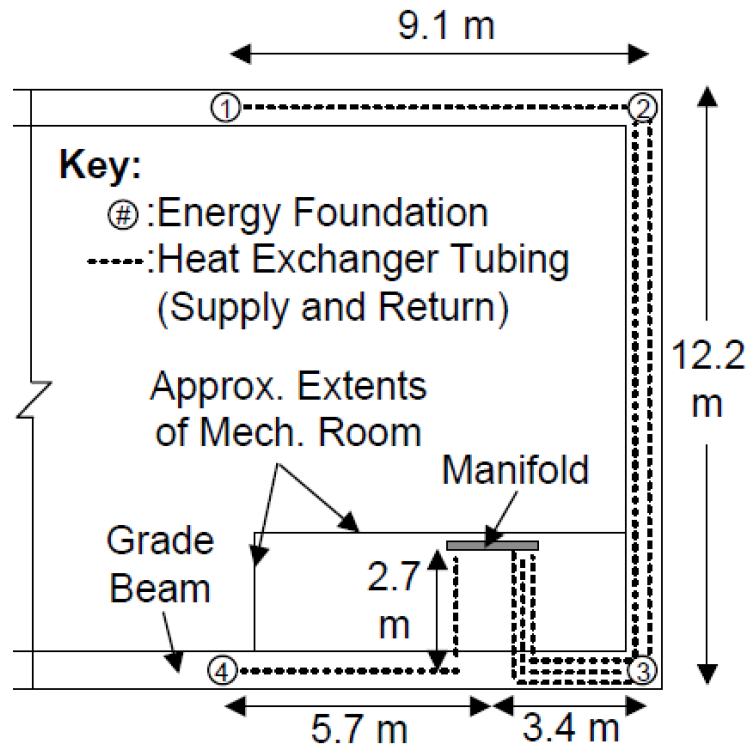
Plan view of run-out tubing connecting Foundations 1-4 to the manifold
